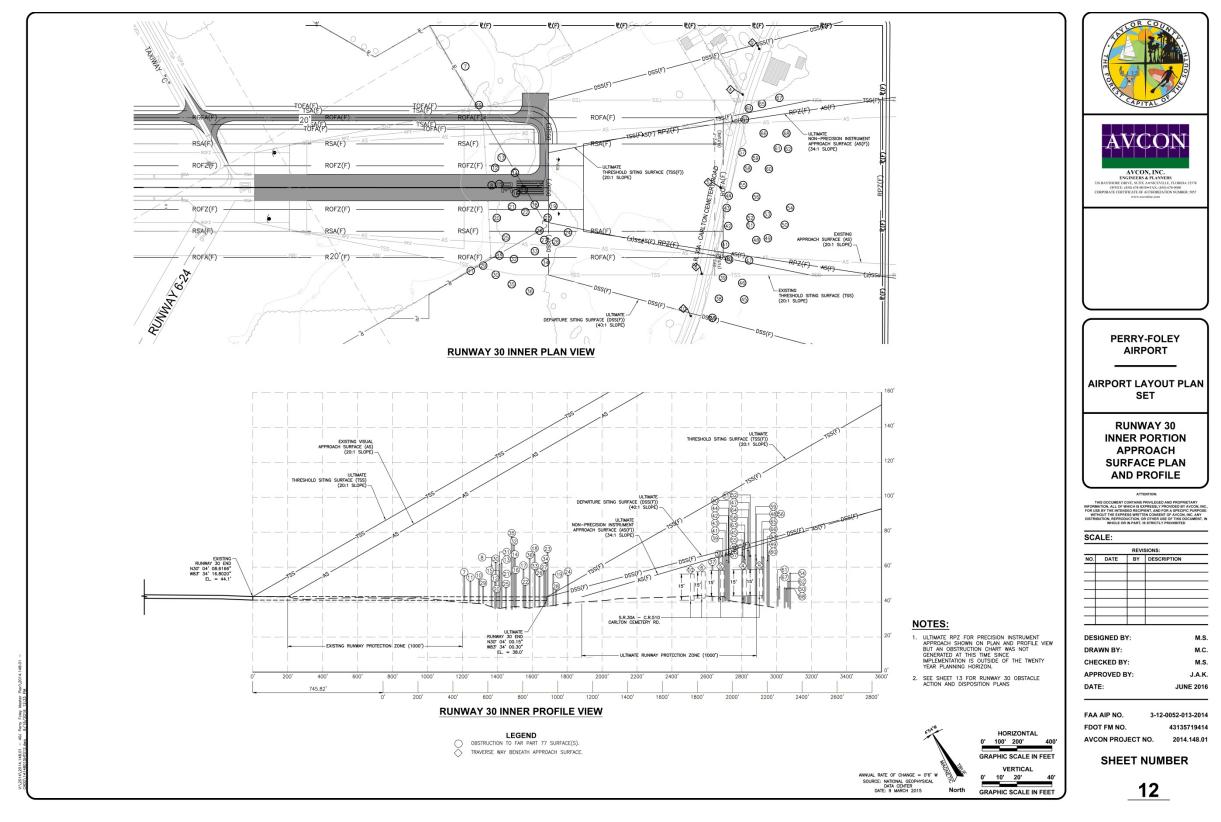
RUNWAY 30 INNER PORTION APPROACH SURFACE PLAN AND PROFILE
